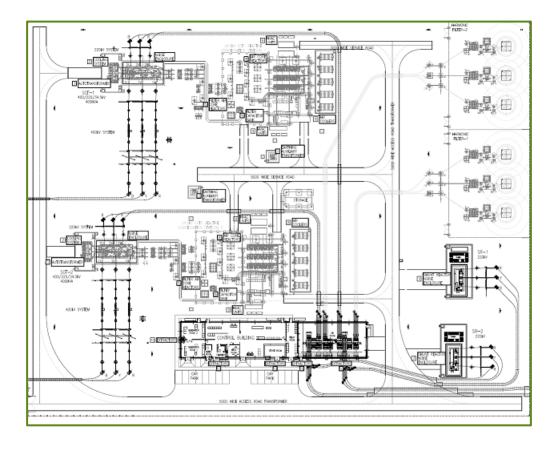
Indicative Onshore Substation Layout - HVAC
